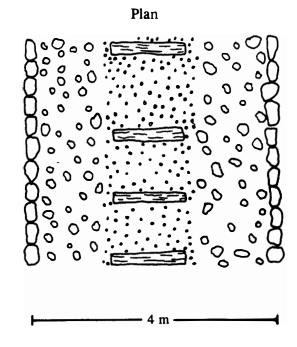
Roughly hewn railroad ties laid in gravel on top of a wider (4 m) road bed.
